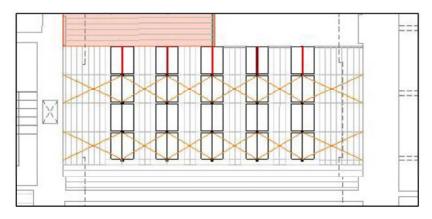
Detailed plan of a section of scaffolding. The red colour indicates bracing structures in the horizontal and vertical planes (elaboration of the students of the post-graduate programme, School of Specialisation in Architectural Heritage and Landscape, C. Tarantino).
